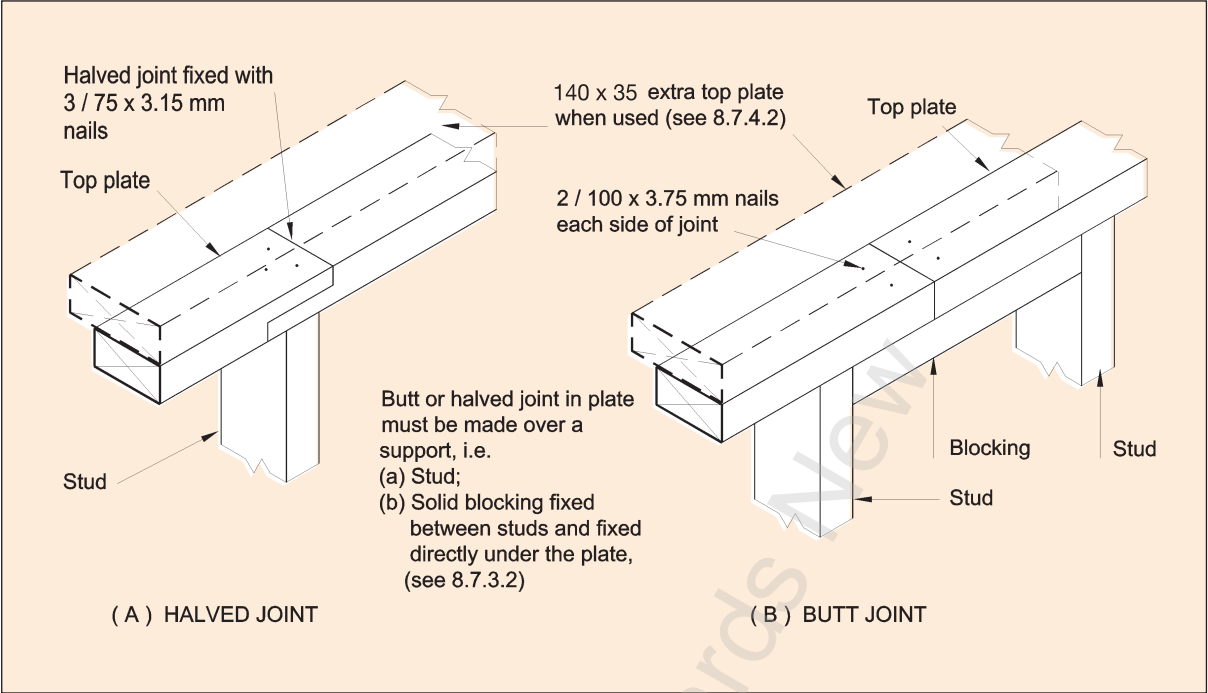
Connecting top plates – Walls not containing bracing (see 8.7.3.2)
